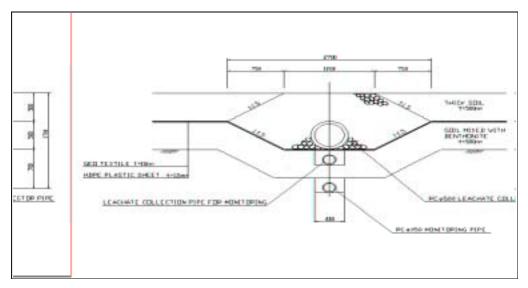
Cross Section of Leachate Collection Pipe
